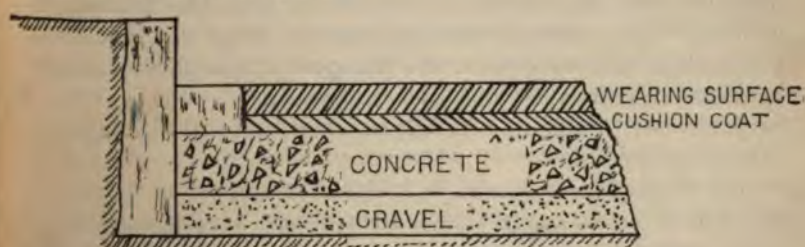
SECTION OF TRINIDAD ASPHALT PAVEMENT.
